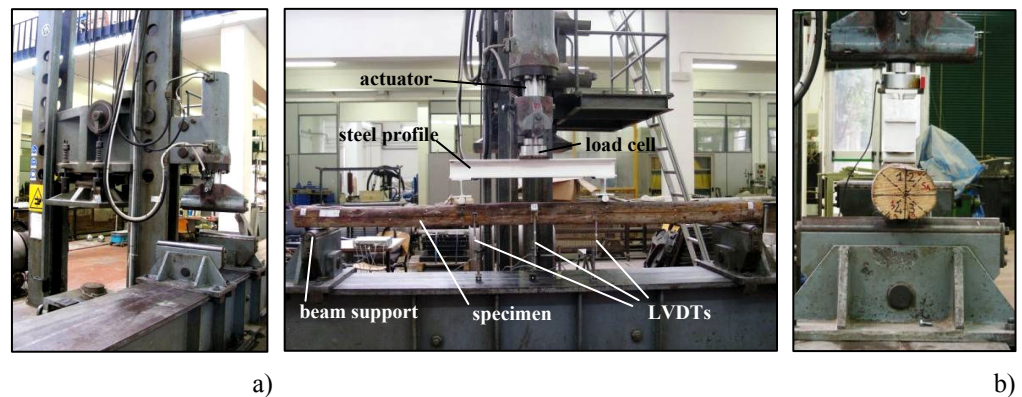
Bending tests on specimens type S_A -B – Testing equipment and set-up:
